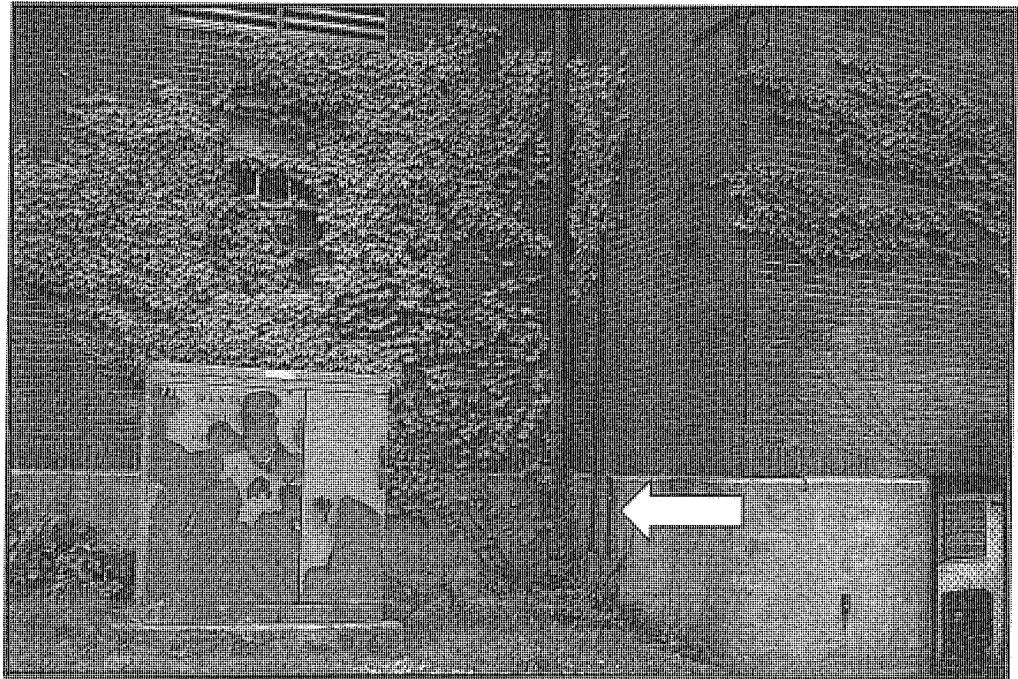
Howe Hall AST fill and vent pipe on northwest side of building.
